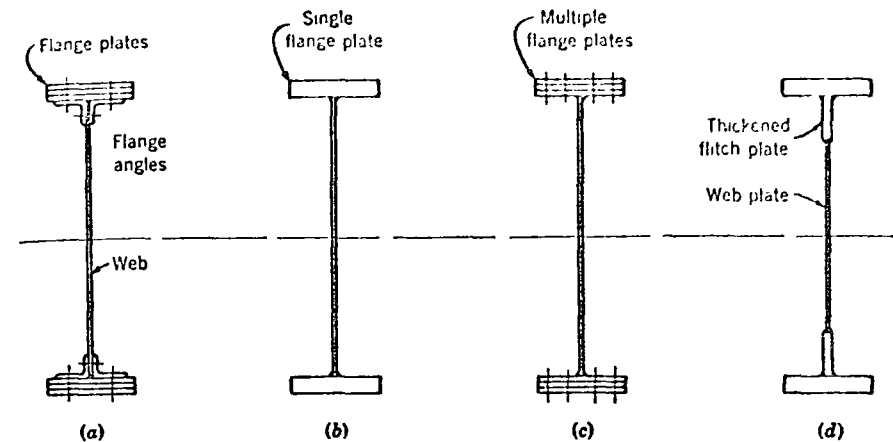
Typical plate girder cross sections: (a) all riveted, (b) all welded; (c) part riveted, part welded; (d) welded with flitch plates.
